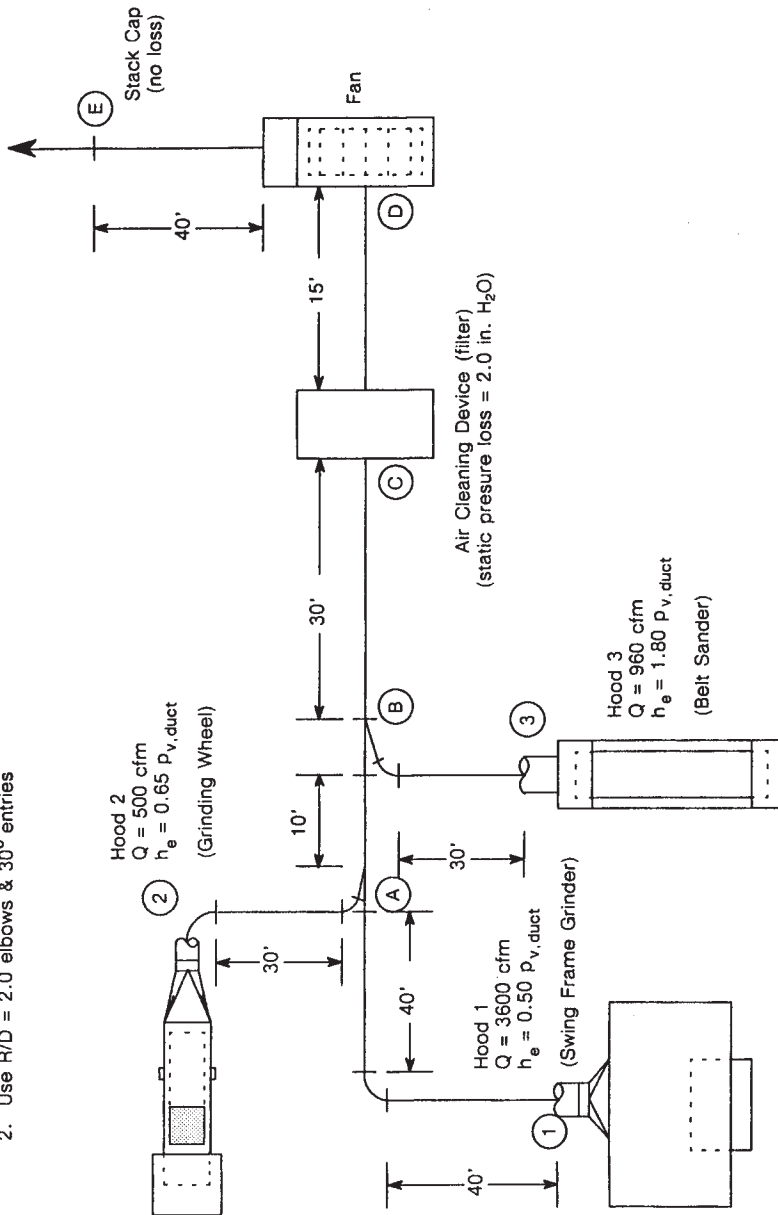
Layout of ductwork for local exhaust ventilation system in the foundry cleaning room.
